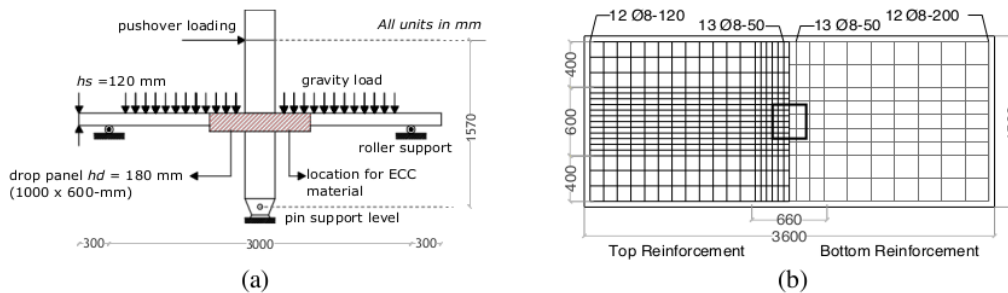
Schematic drawing of the specimen. (a) Geometry and loading form, (b) reinforcement layout.
